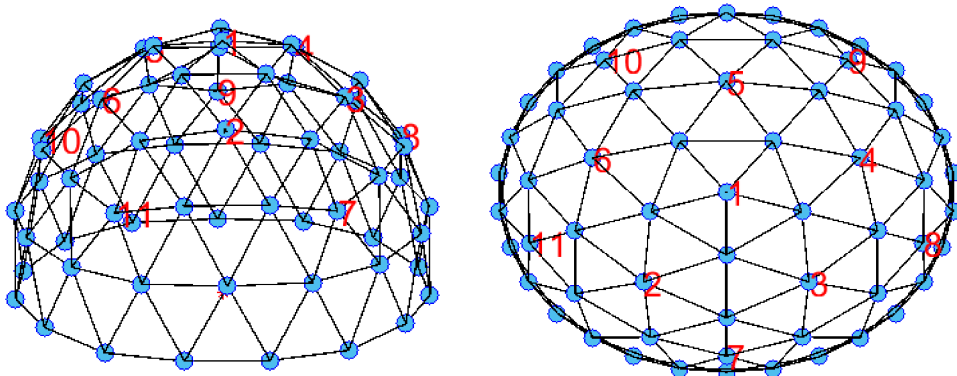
Impact measurement including 11 accelerometers: elevation view and plan view
